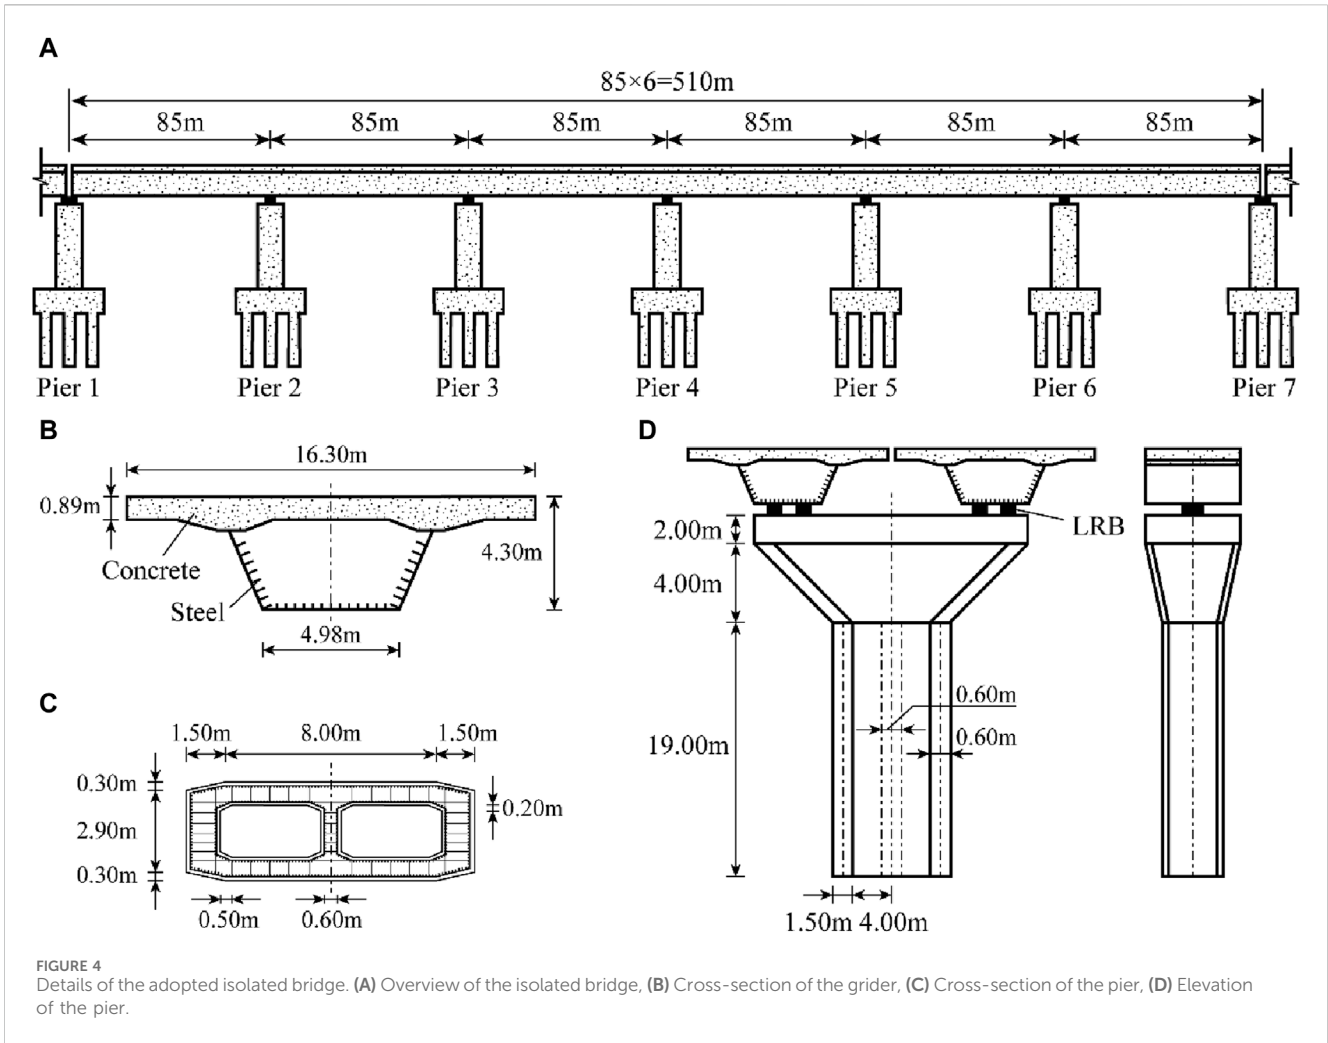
Details of the adopted isolated bridge. (A) Overview of the isolated bridge, (B) Cross-section of the girder, (C) Cross-section of the pier, (D) Elevation of the pier.
